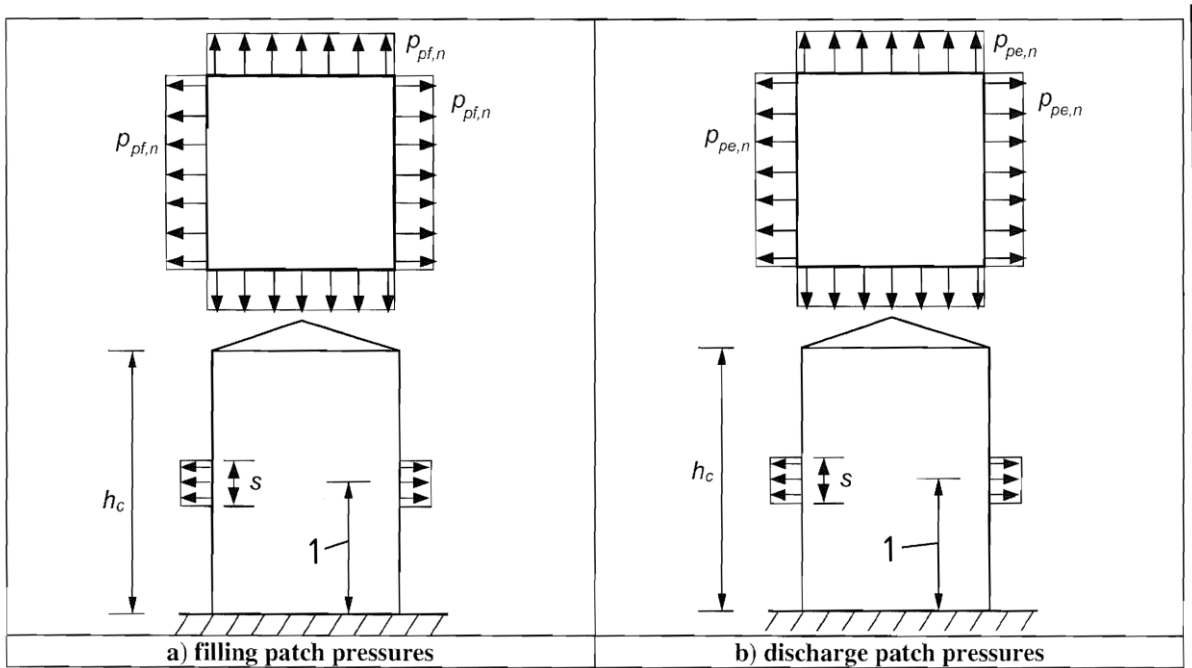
Non-circular silos: side elevation and plan view of patch loads.
